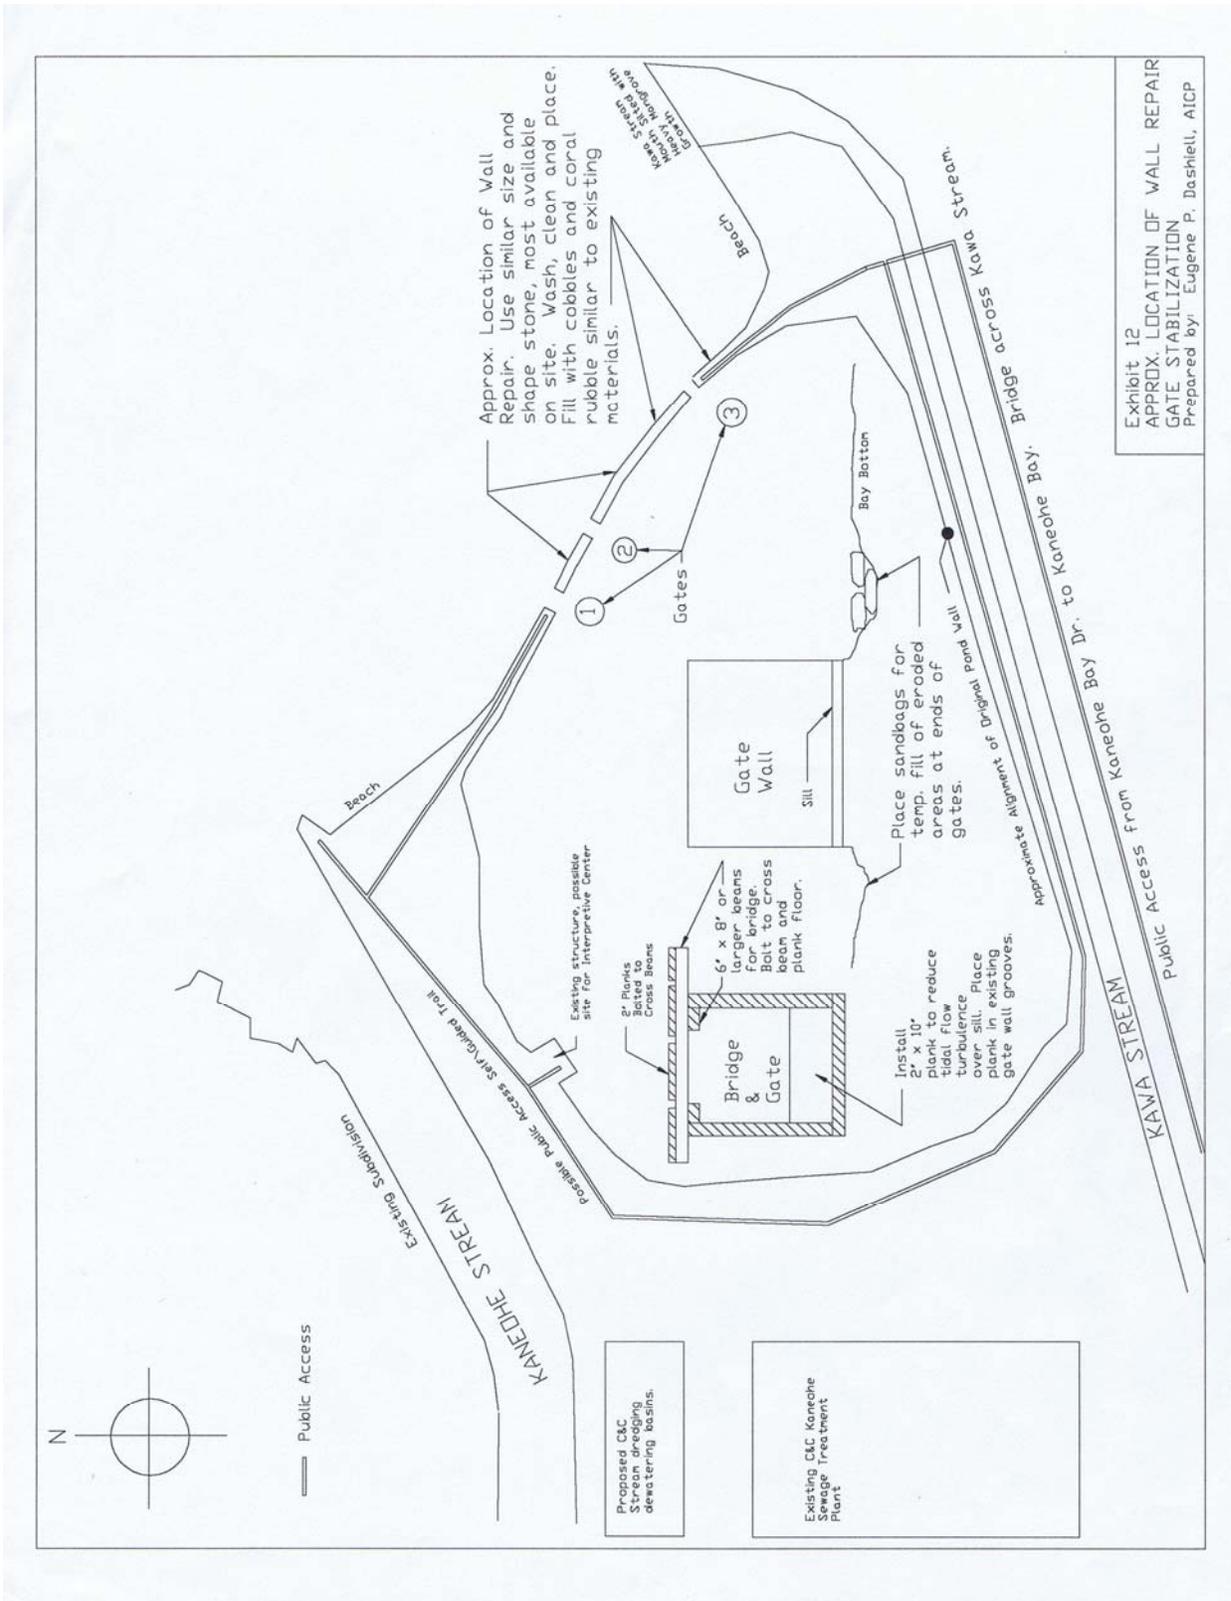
Plan Drawing of Waikalua Loko in 1995 Showing Wall and Makaha repair (Dashiell 1995:Exhibit 12)
